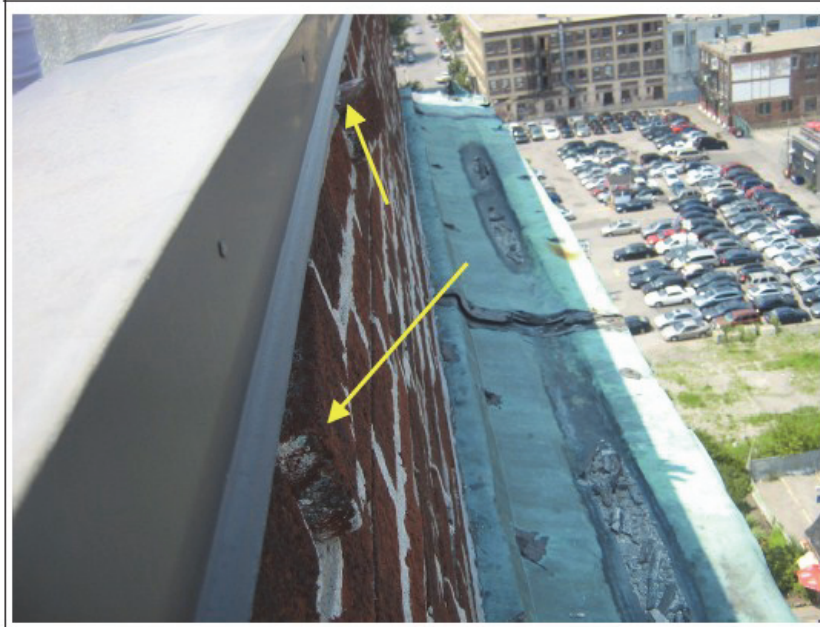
Loose bricks and deteriorated mortar joints on east elevation of parapet.
